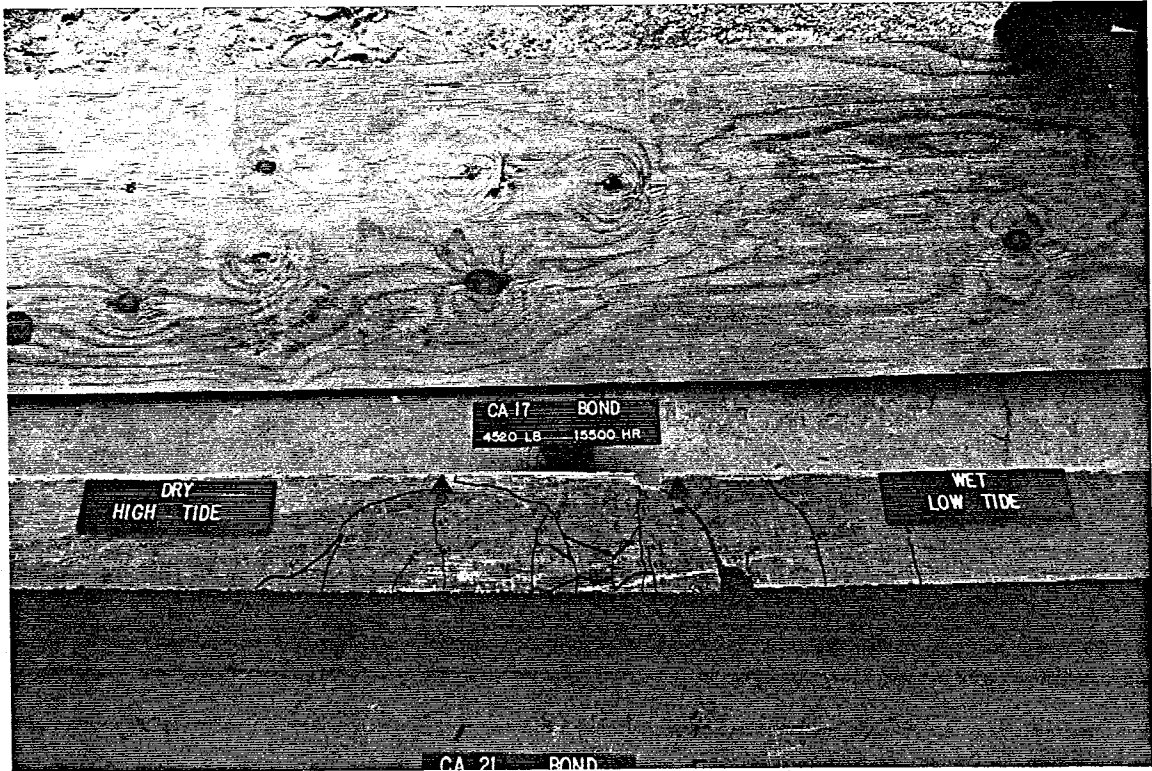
Crack Pattern for Beam CA 17 - Tested After 15,500 Hours
